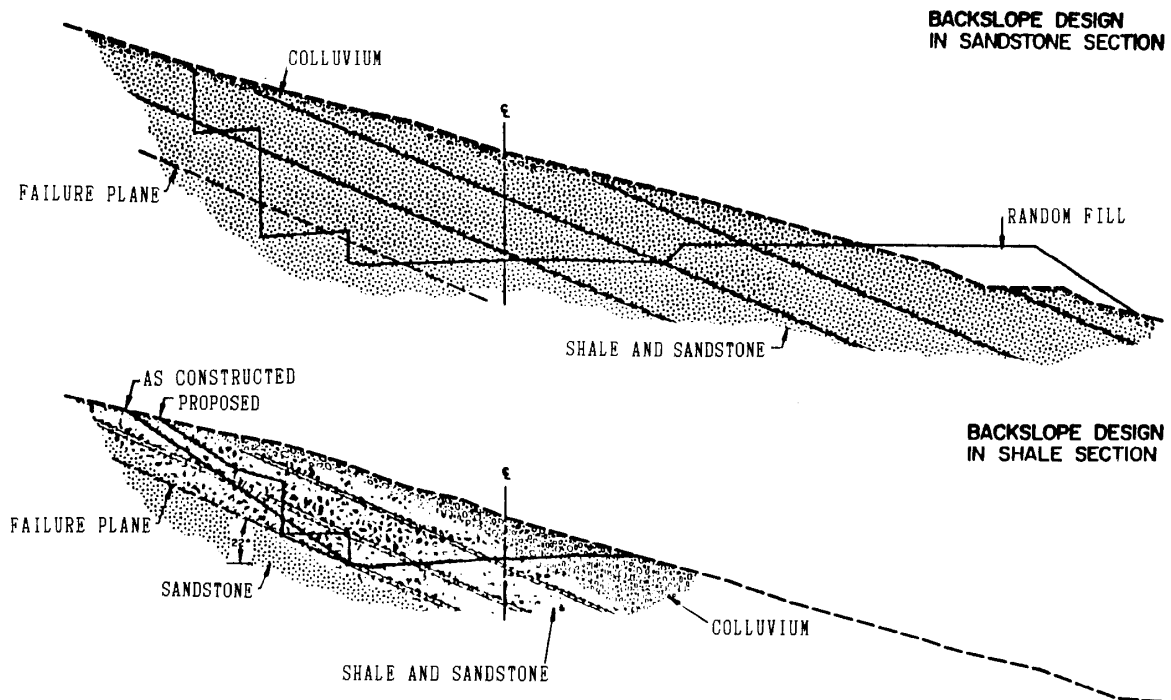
Design sections south slope Clinch Mountain. (Reference 26)
